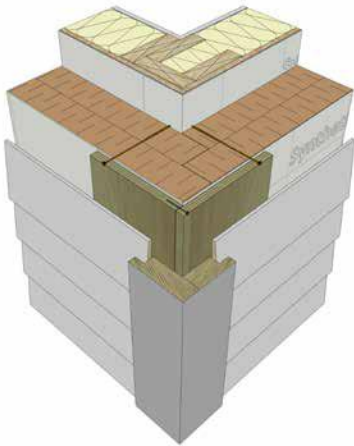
Wider corner strapping installation where corner trim must be installed onto strapping.
